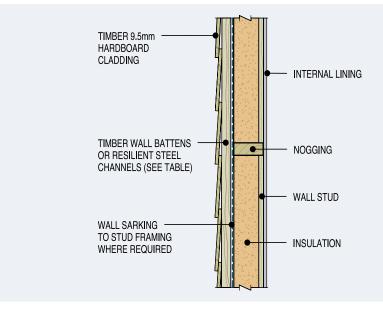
9.5 mm Hardwood Plank cladding. Vertical section through wall
